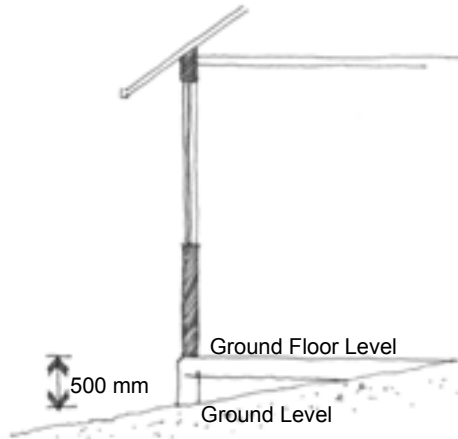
The finished ground floor level can be no more than 500mm above ground level.
